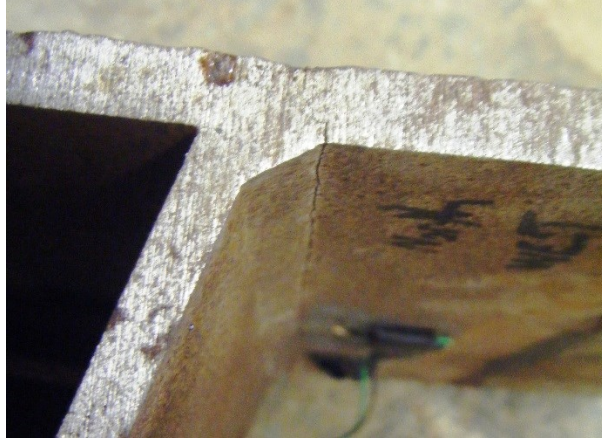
Toe-deck cracking that accompanied weld-root cracking on Specimen A21.
